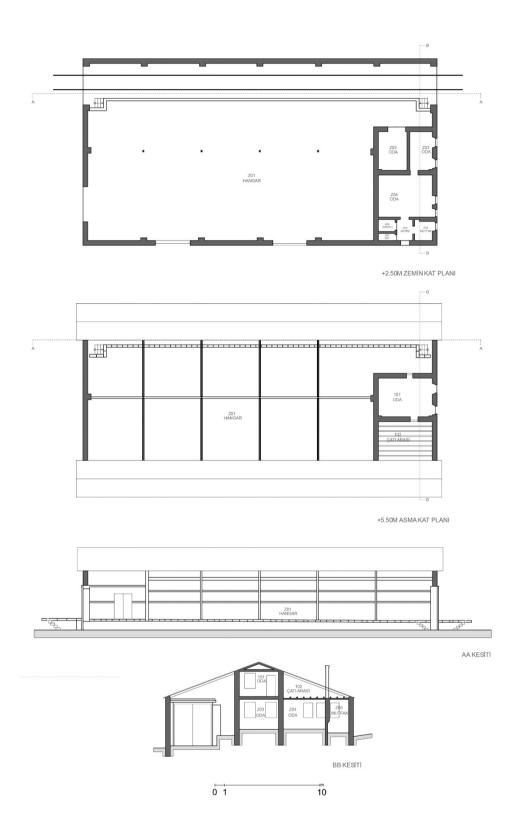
Drawings of Warehouse Building (Sinan, 2019)
